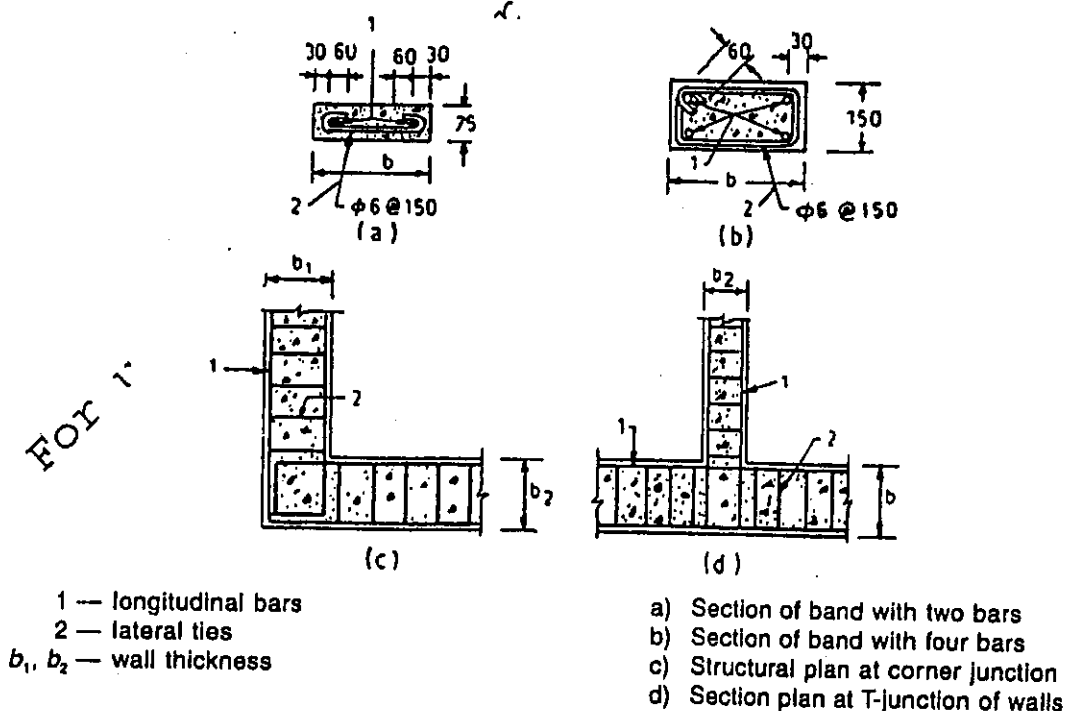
REINFORCEMENT AND BENDING DETAIL IN R. C. BAND
